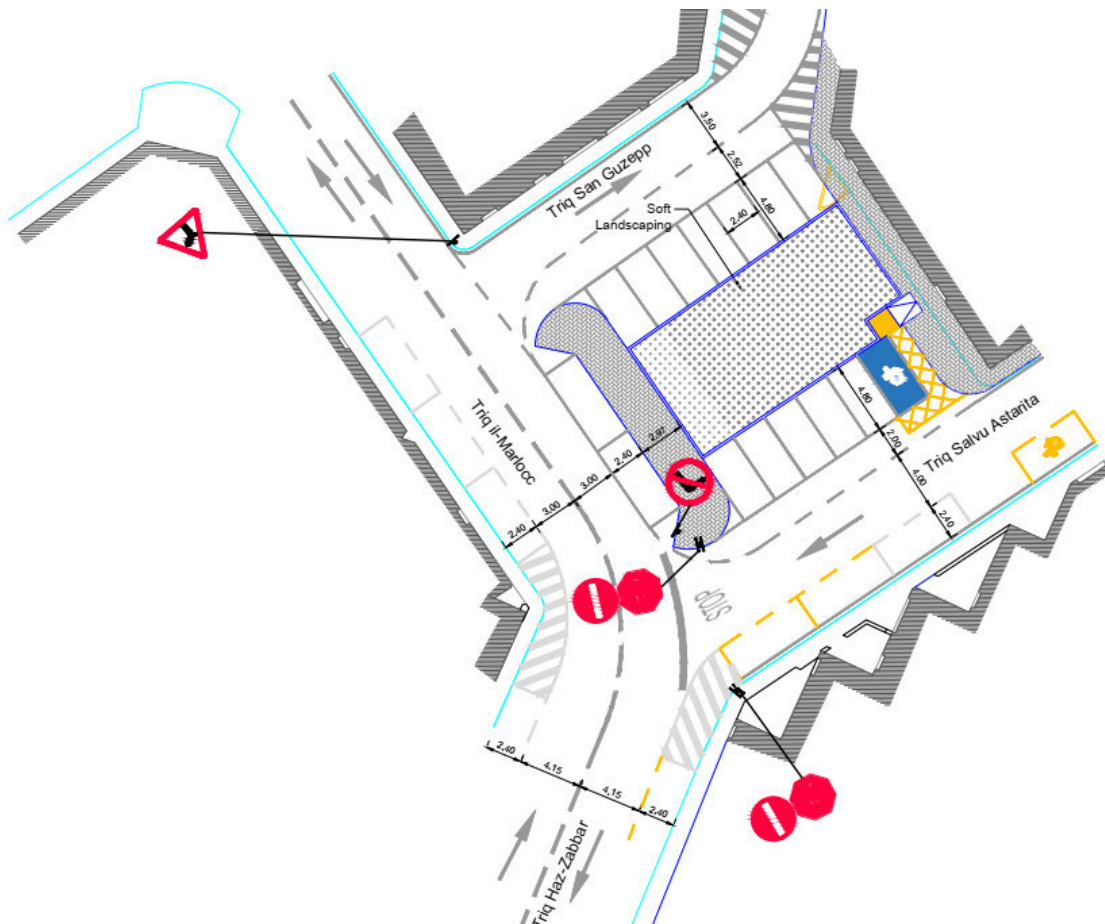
Architect's proposal for the design of public open space and parking arrangement within Site 2
